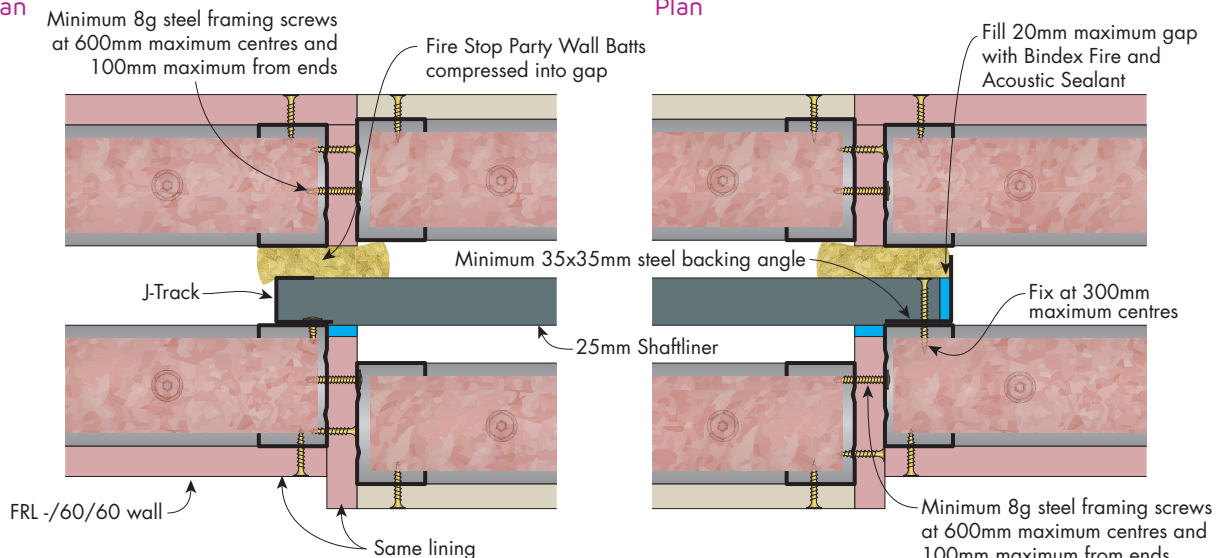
InterHome High-Rise Wall Transition to Single Stud Fire Rated Plasterboard Wall Plan
